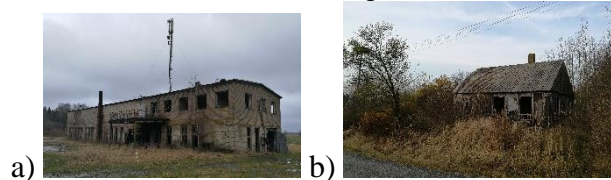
Abandoned buildings in Plungė district municipality: a – mechanical workshop, b – dwelling house
